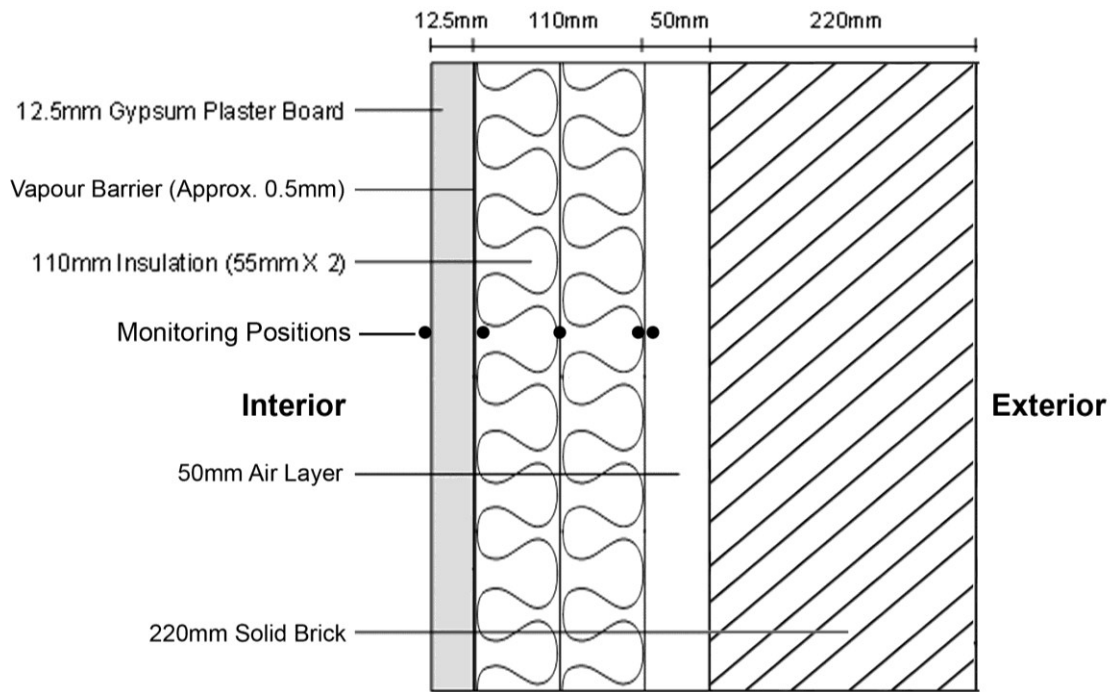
The vertical cross section of the solid brick wall assembly (with air gap) assembly with vapour barrier (wall-6).
